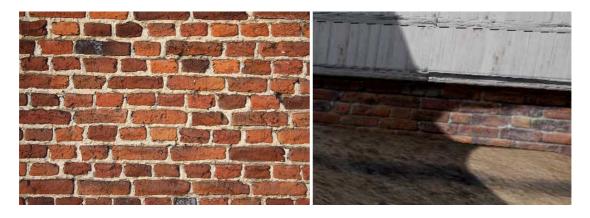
'English bond' construction (left) and the inner gallery foundation wall in the model (right)
